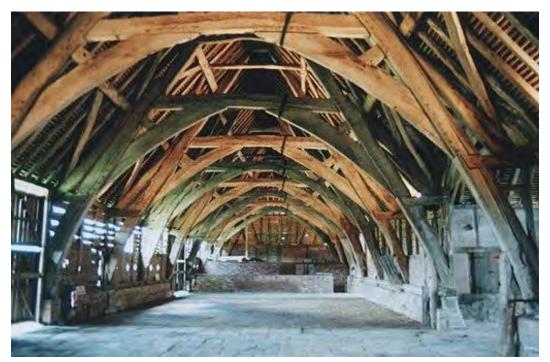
Cruck framing as seen in the Leigh Court Tithe Barn in Worcester, England. Note how the cruck beams are A-shaped timbers that extend short foundation walls.⁵
